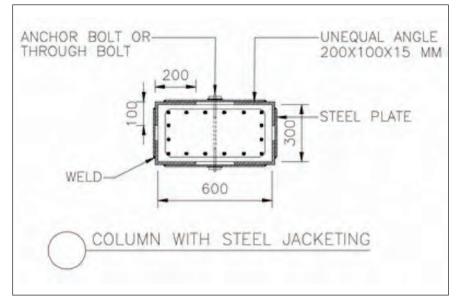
Geometry and reinforcement details of Steel-jacketed column
